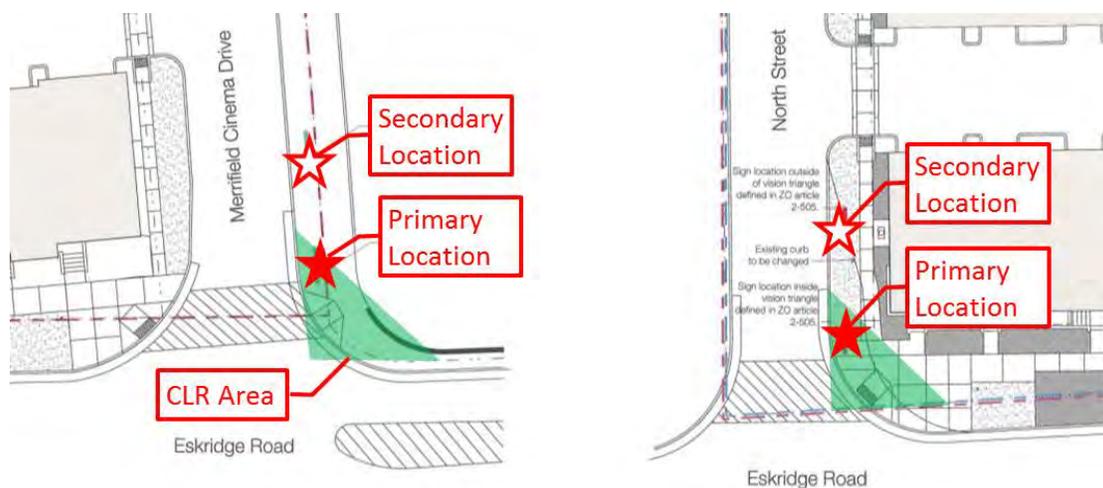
Detail of principal and secondary placement options for ST102 and ST102b.
